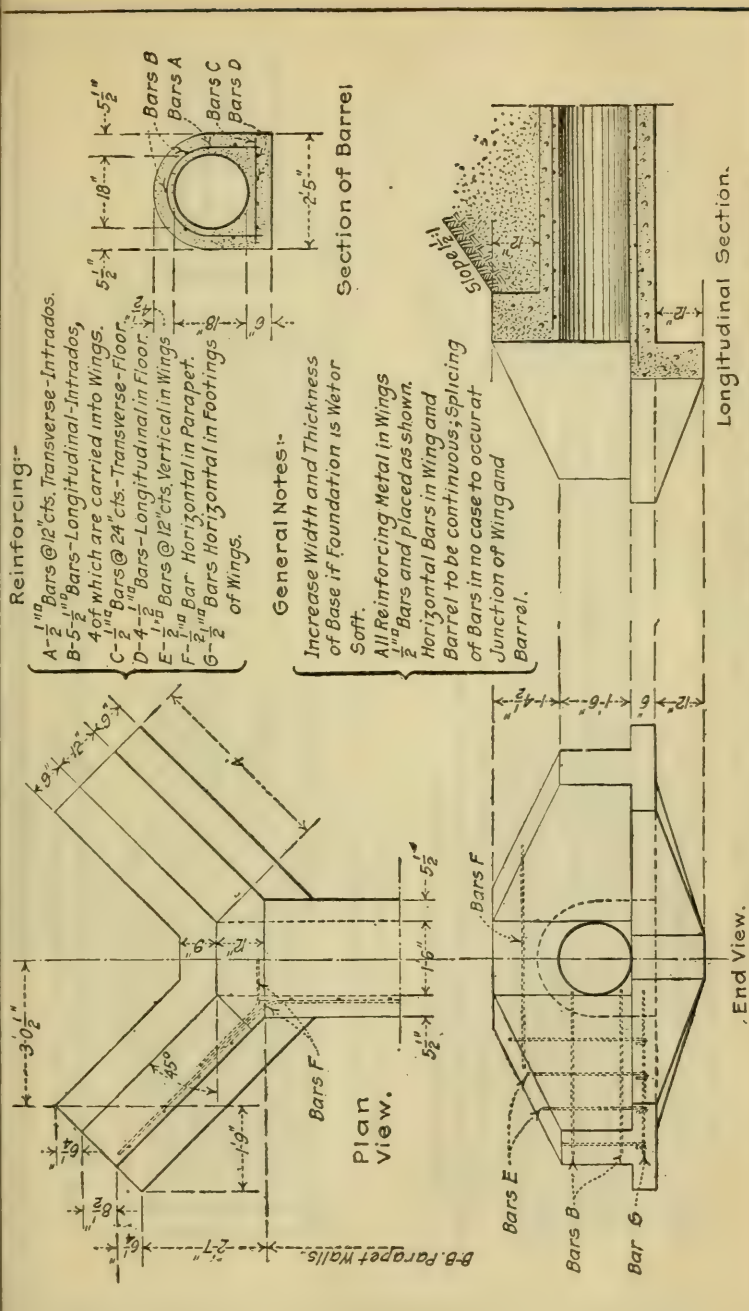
B.—State of Iowa 18" circular concrete culverts.
